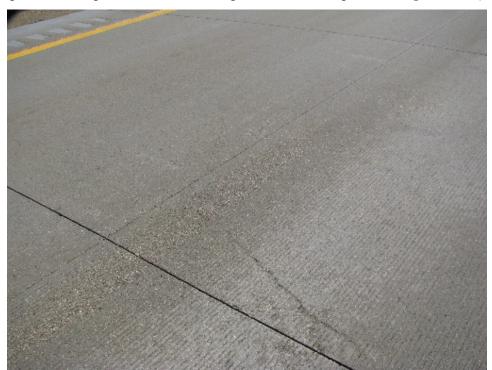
Irregular reflective cracking due to wrinkled geotextile separation layer
